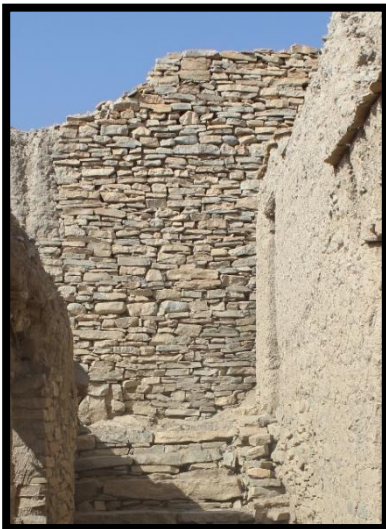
17 Mud Brick wall constructed with "Sarooj"
